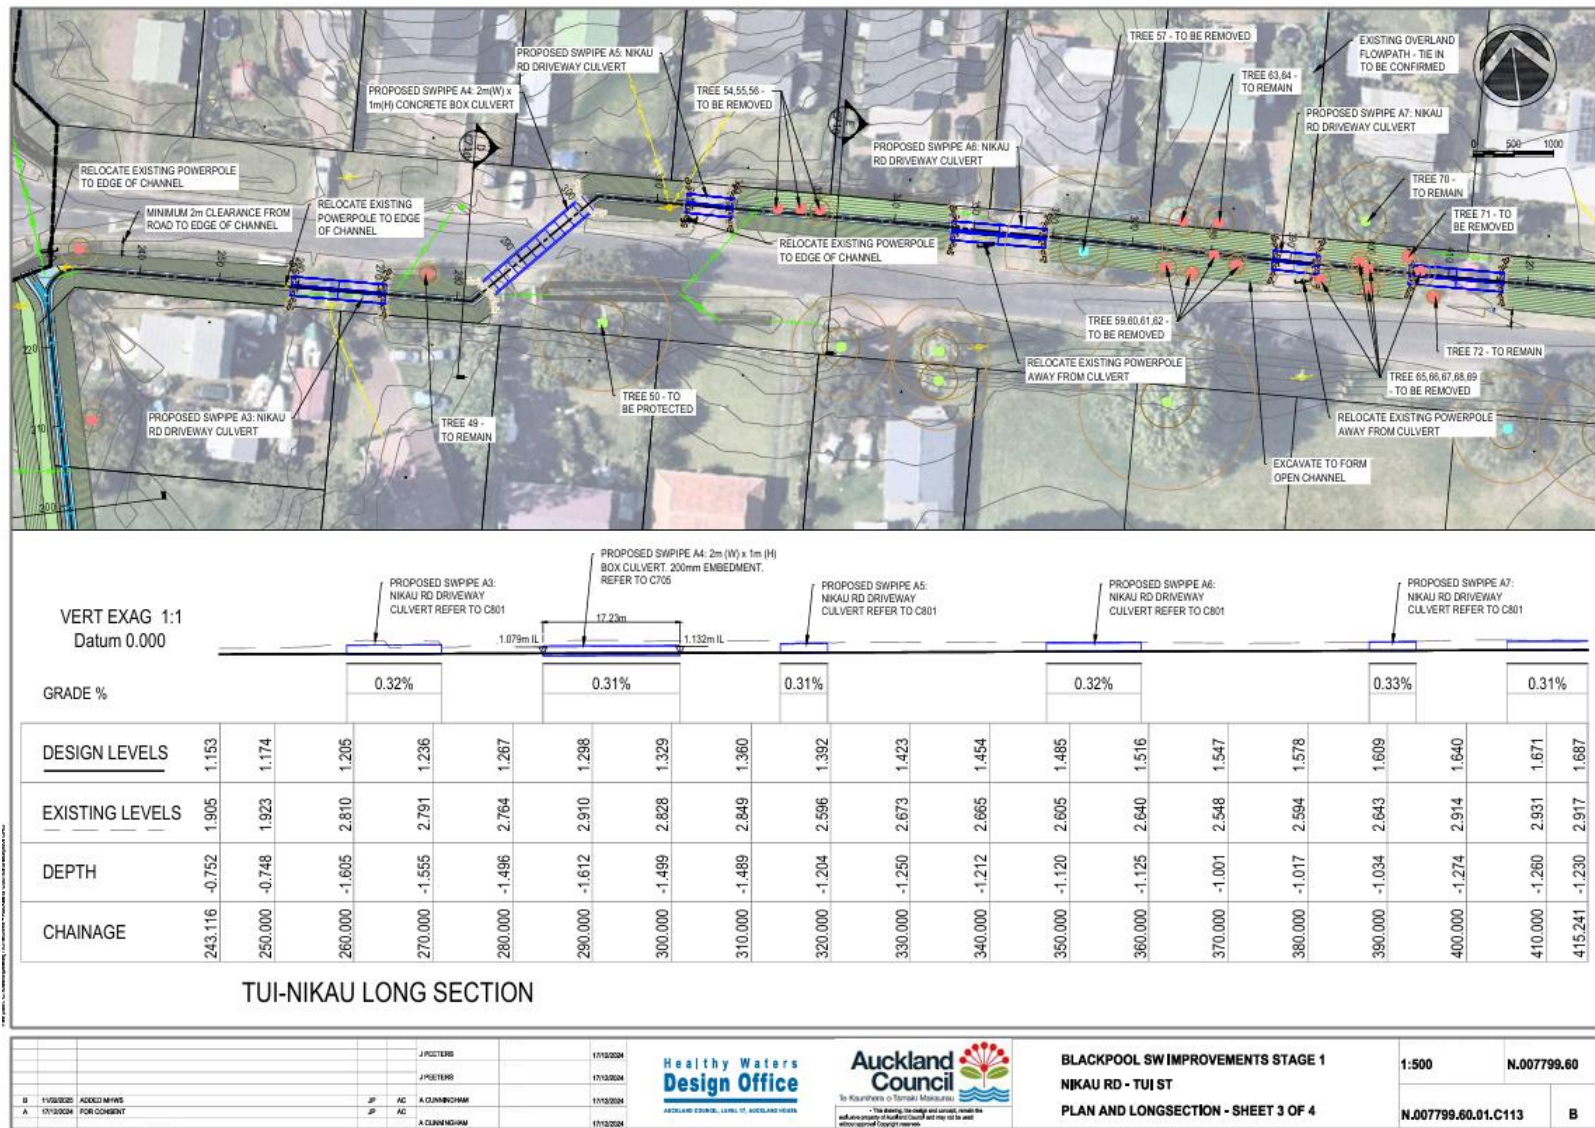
Blackpool SW Improvements Stage 1 Nikau Rd – Tui St Plan and Longsection – Sheet 3 of 4
